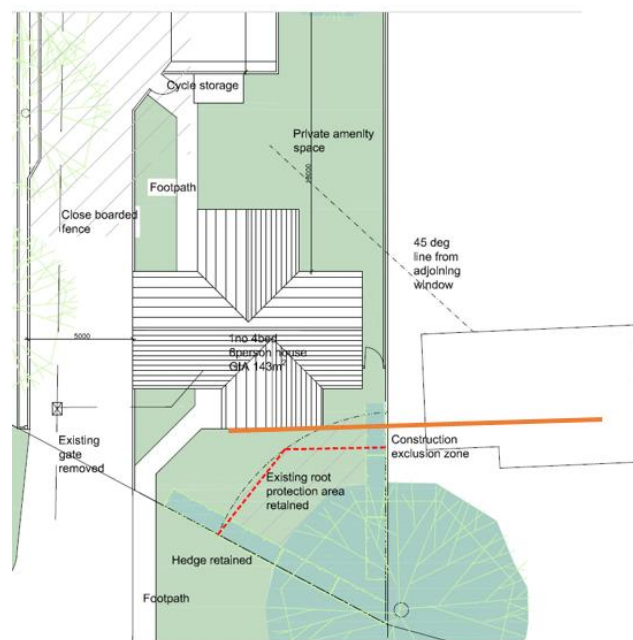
Building line of the new dwelling in reference to property no. 18 Pitts Lane
